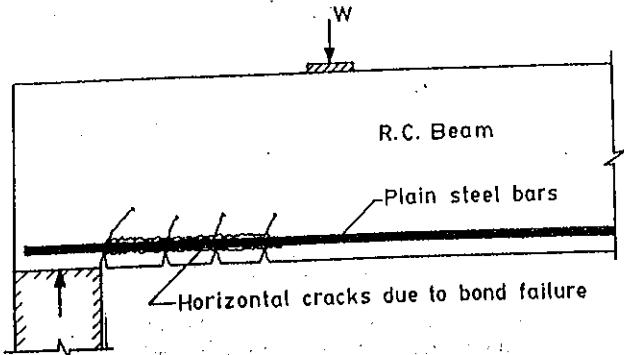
Typical Horizontal Cracks due to Bond Failure
